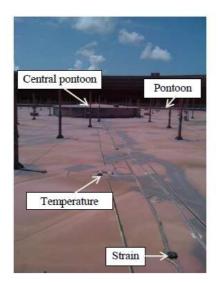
Actual floating roof equipped with pontoon and center pontoon.
